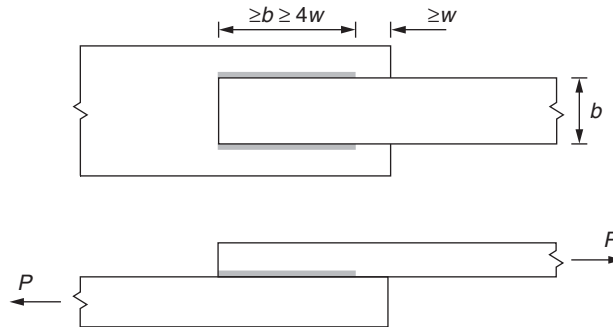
Fillet weld minimum dimensions.
